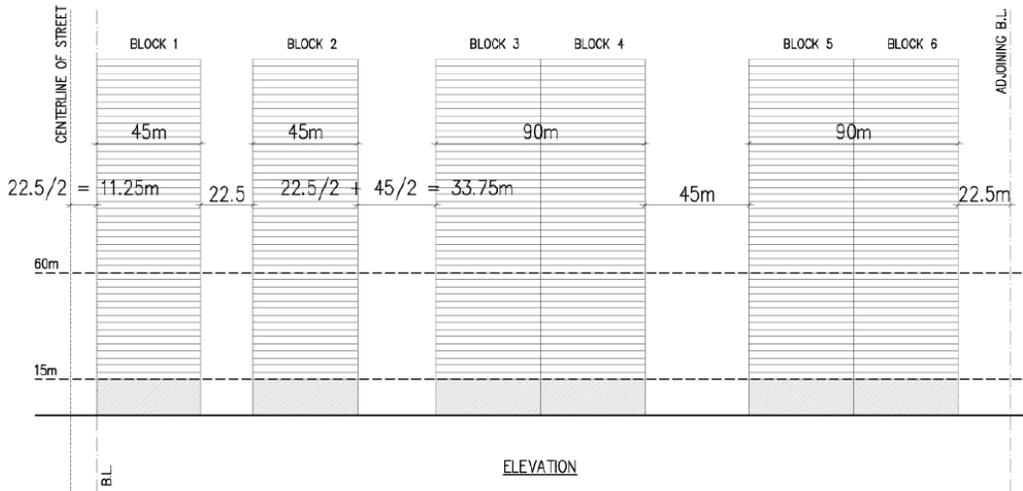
Example of building separation (S) calculation: H > 60m & Site > 2 ha [i.e., building permeability (P) ≥ 33.3%]
